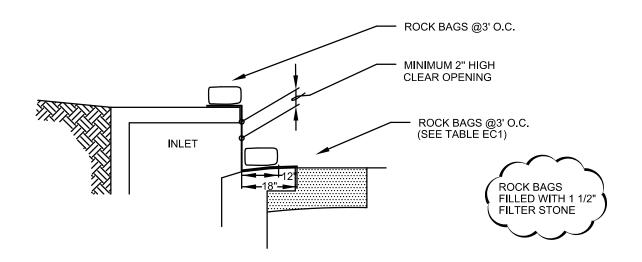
STANDARD CONSTRUCTION DETAIL - FILTER TUBE CURB INLET PROTECTION
